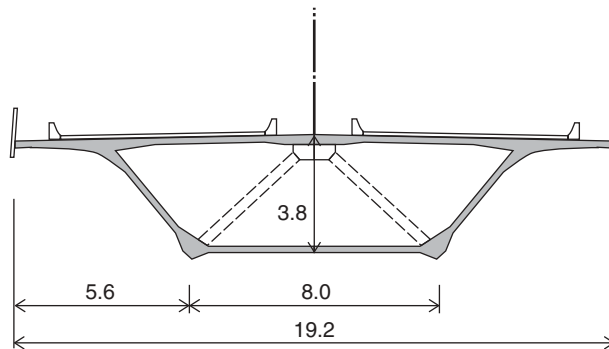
Cross section of the deck in the Farø Bridge (Denmark)
